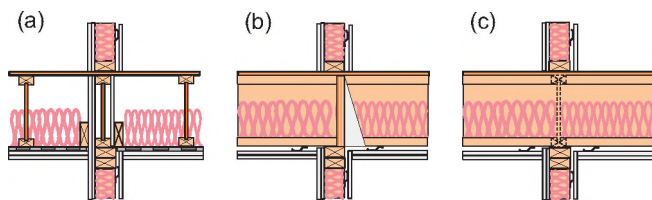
Construction details of the 3 wall/floor systems. Joists were oriented (a) parallel to the wall, (b) perpendicular to the wall, or (c) with joists continuous across the wall, perpendicular to it.
